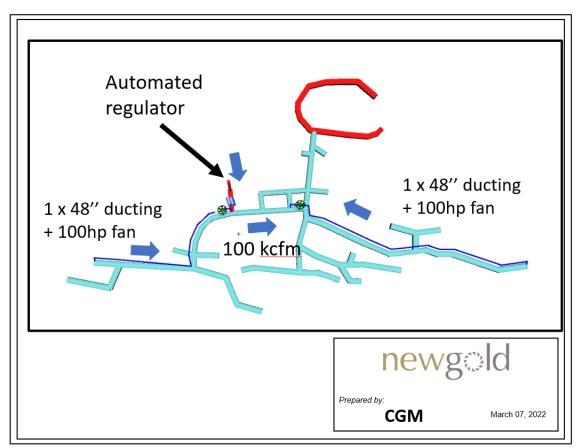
Typical Auxiliary Ventilation Arrangement for a Level when the air is taken from the Internal Raise
